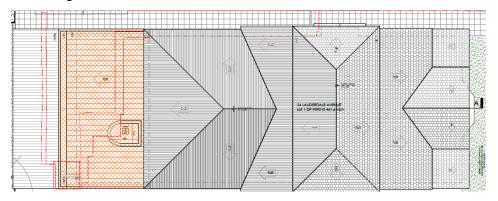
Roof plan showing changes proposed to rear roof addition (Noble Architecture)
